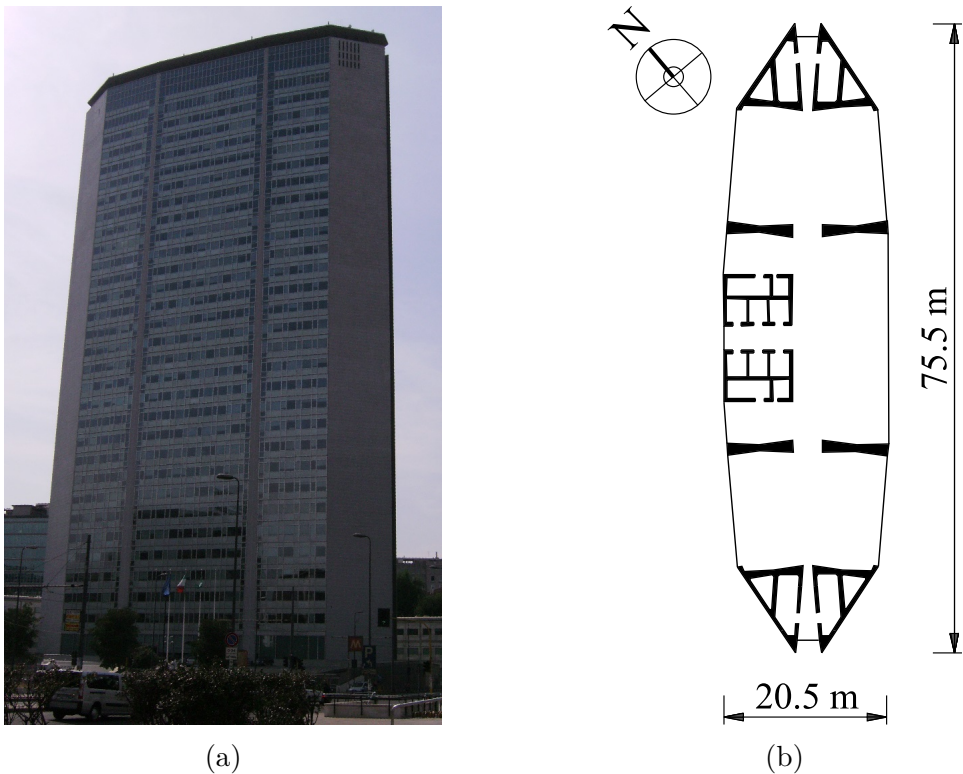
Pirelli Tower. (a) South-east view; (b) Typical floor plan
